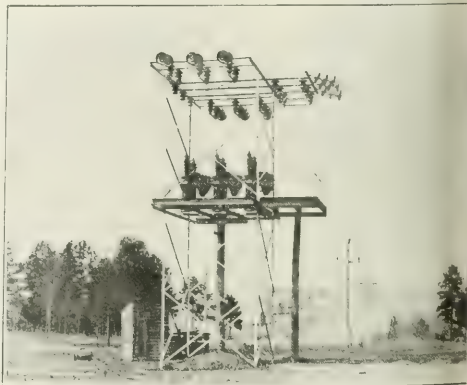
Oil Circuit-Breaker Mounted on Steel Tower.
